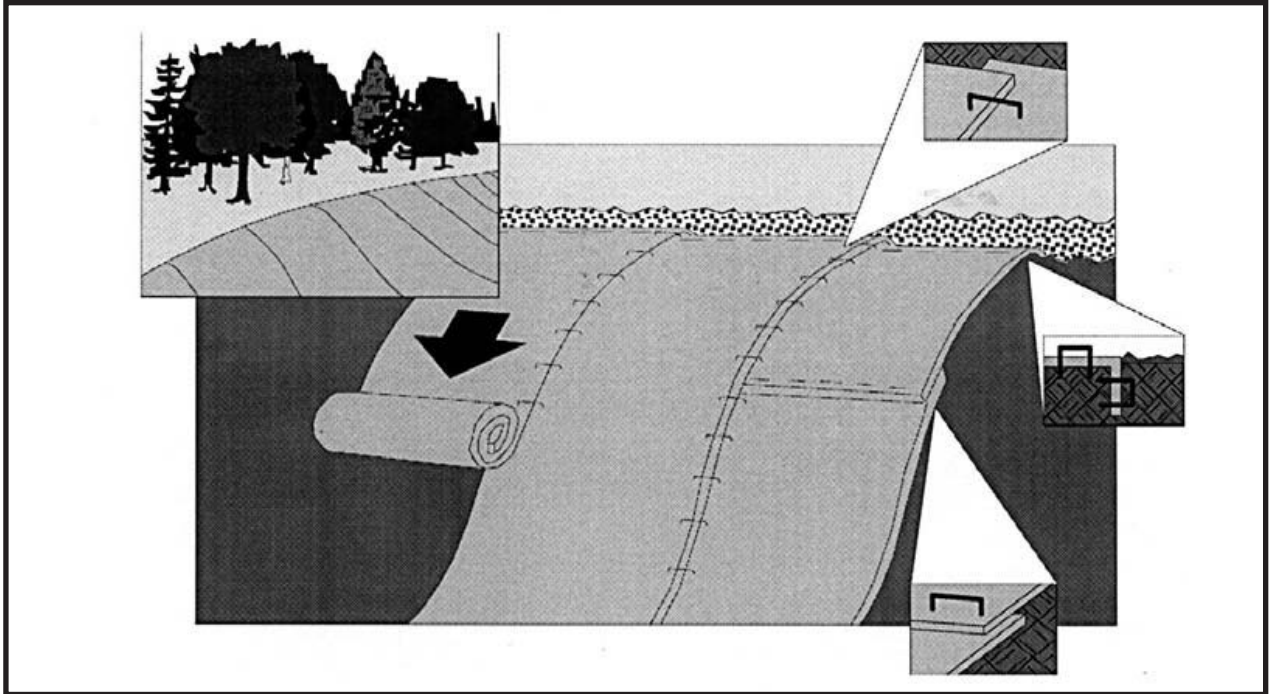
Typical installation of erosion control blankets on a slope - Consult manufacturer for recommendations on proper installation of staple patterns, overlap and keying edges.
